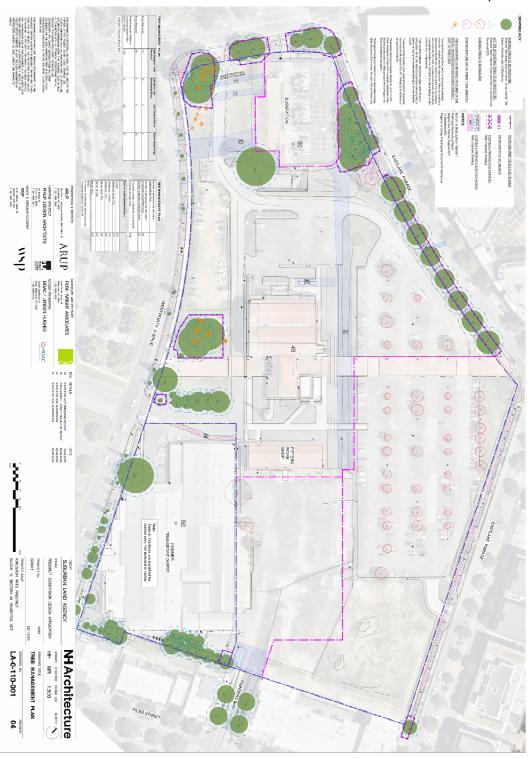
Snapshot of trees 149, 150, and 152 on the Tree Management Plan site plan outlining the Tree Protection Fencing in PURPLE.
